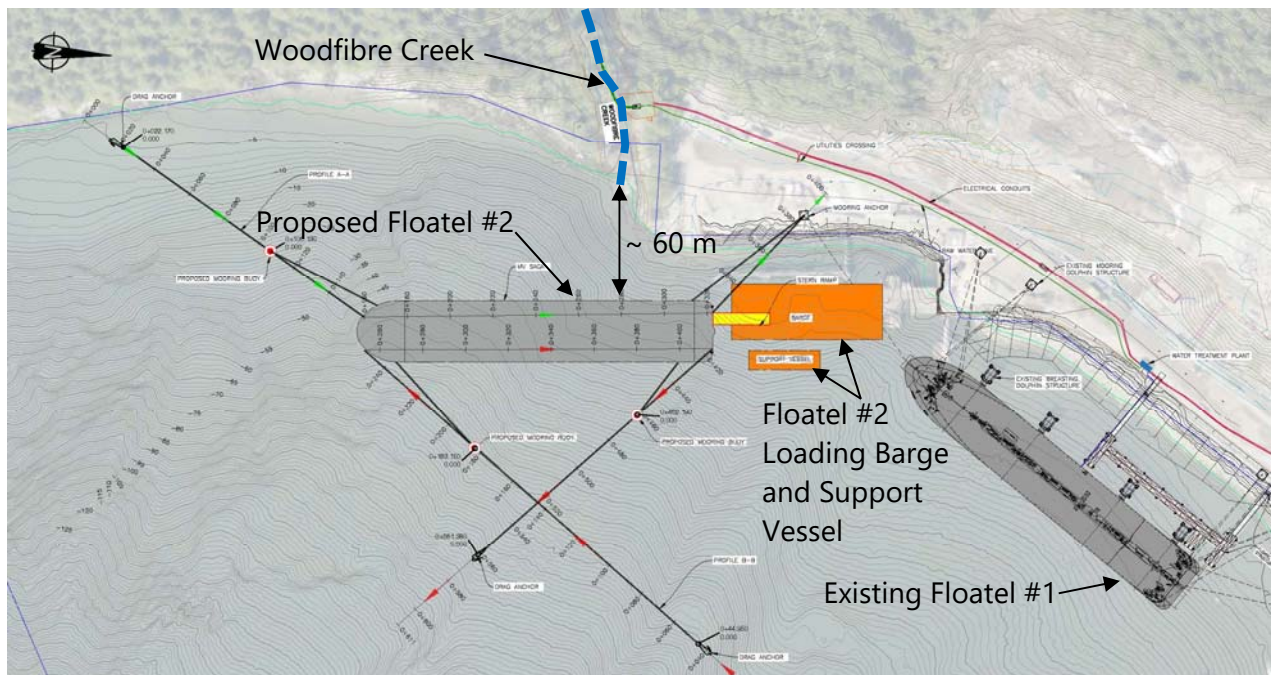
Proposed Floatel #2 Location - Plan (image source: Woodfibre LNG)
